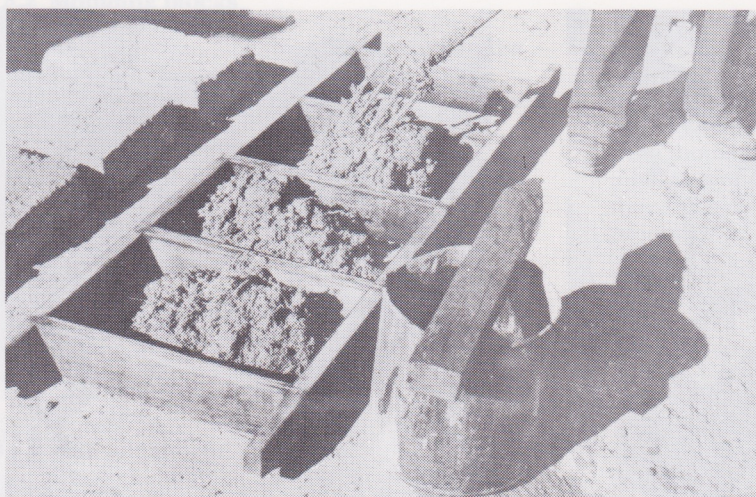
The use of a multiple mould for making adobe blocks
